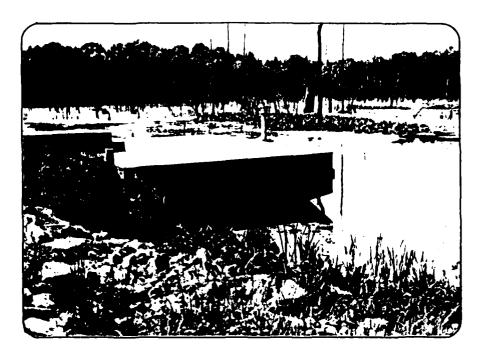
View of Intake Structure at Principal Spillway of Upper Dam
